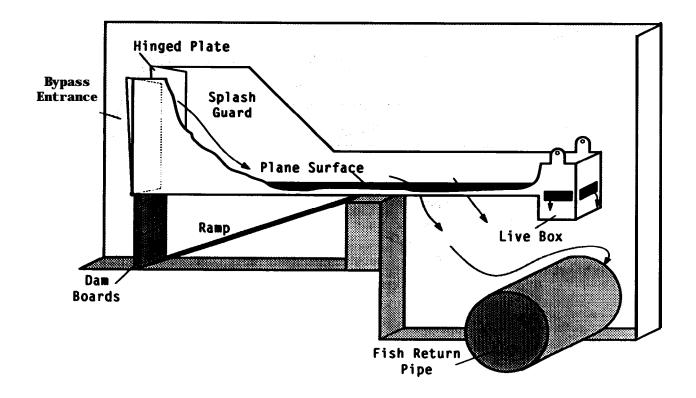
Inclined Plane Used at the Town Canal Fish Screening Facility, Spring 1990
